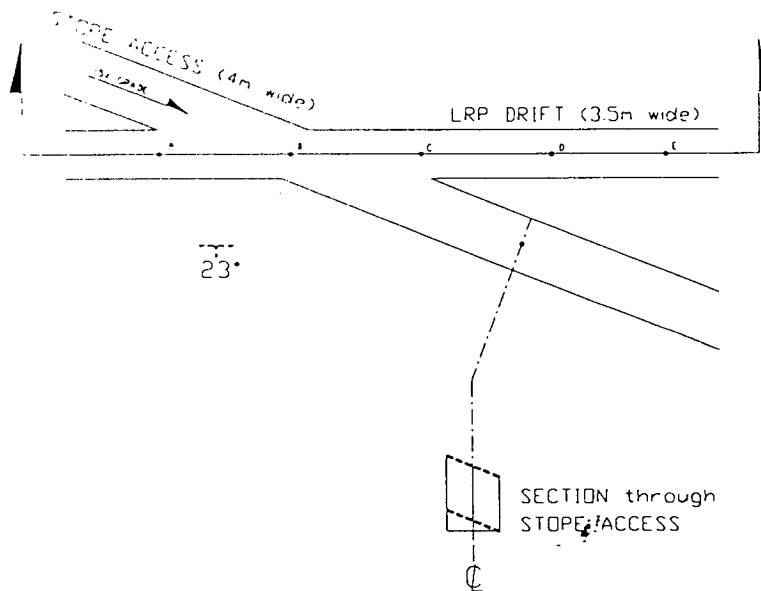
Plan and Section of Longitudinal Room and Pillar Stope showing detail of typical drift intersection
